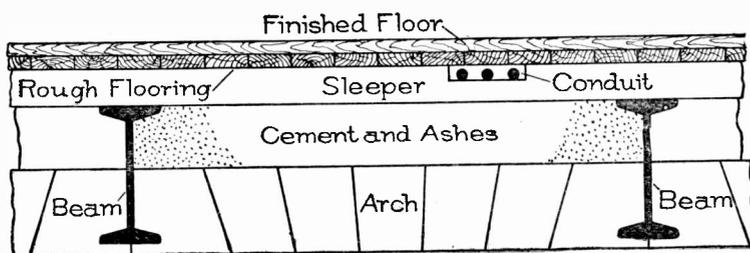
Running Conductors Concealed under Floor in Fireproof Building.
